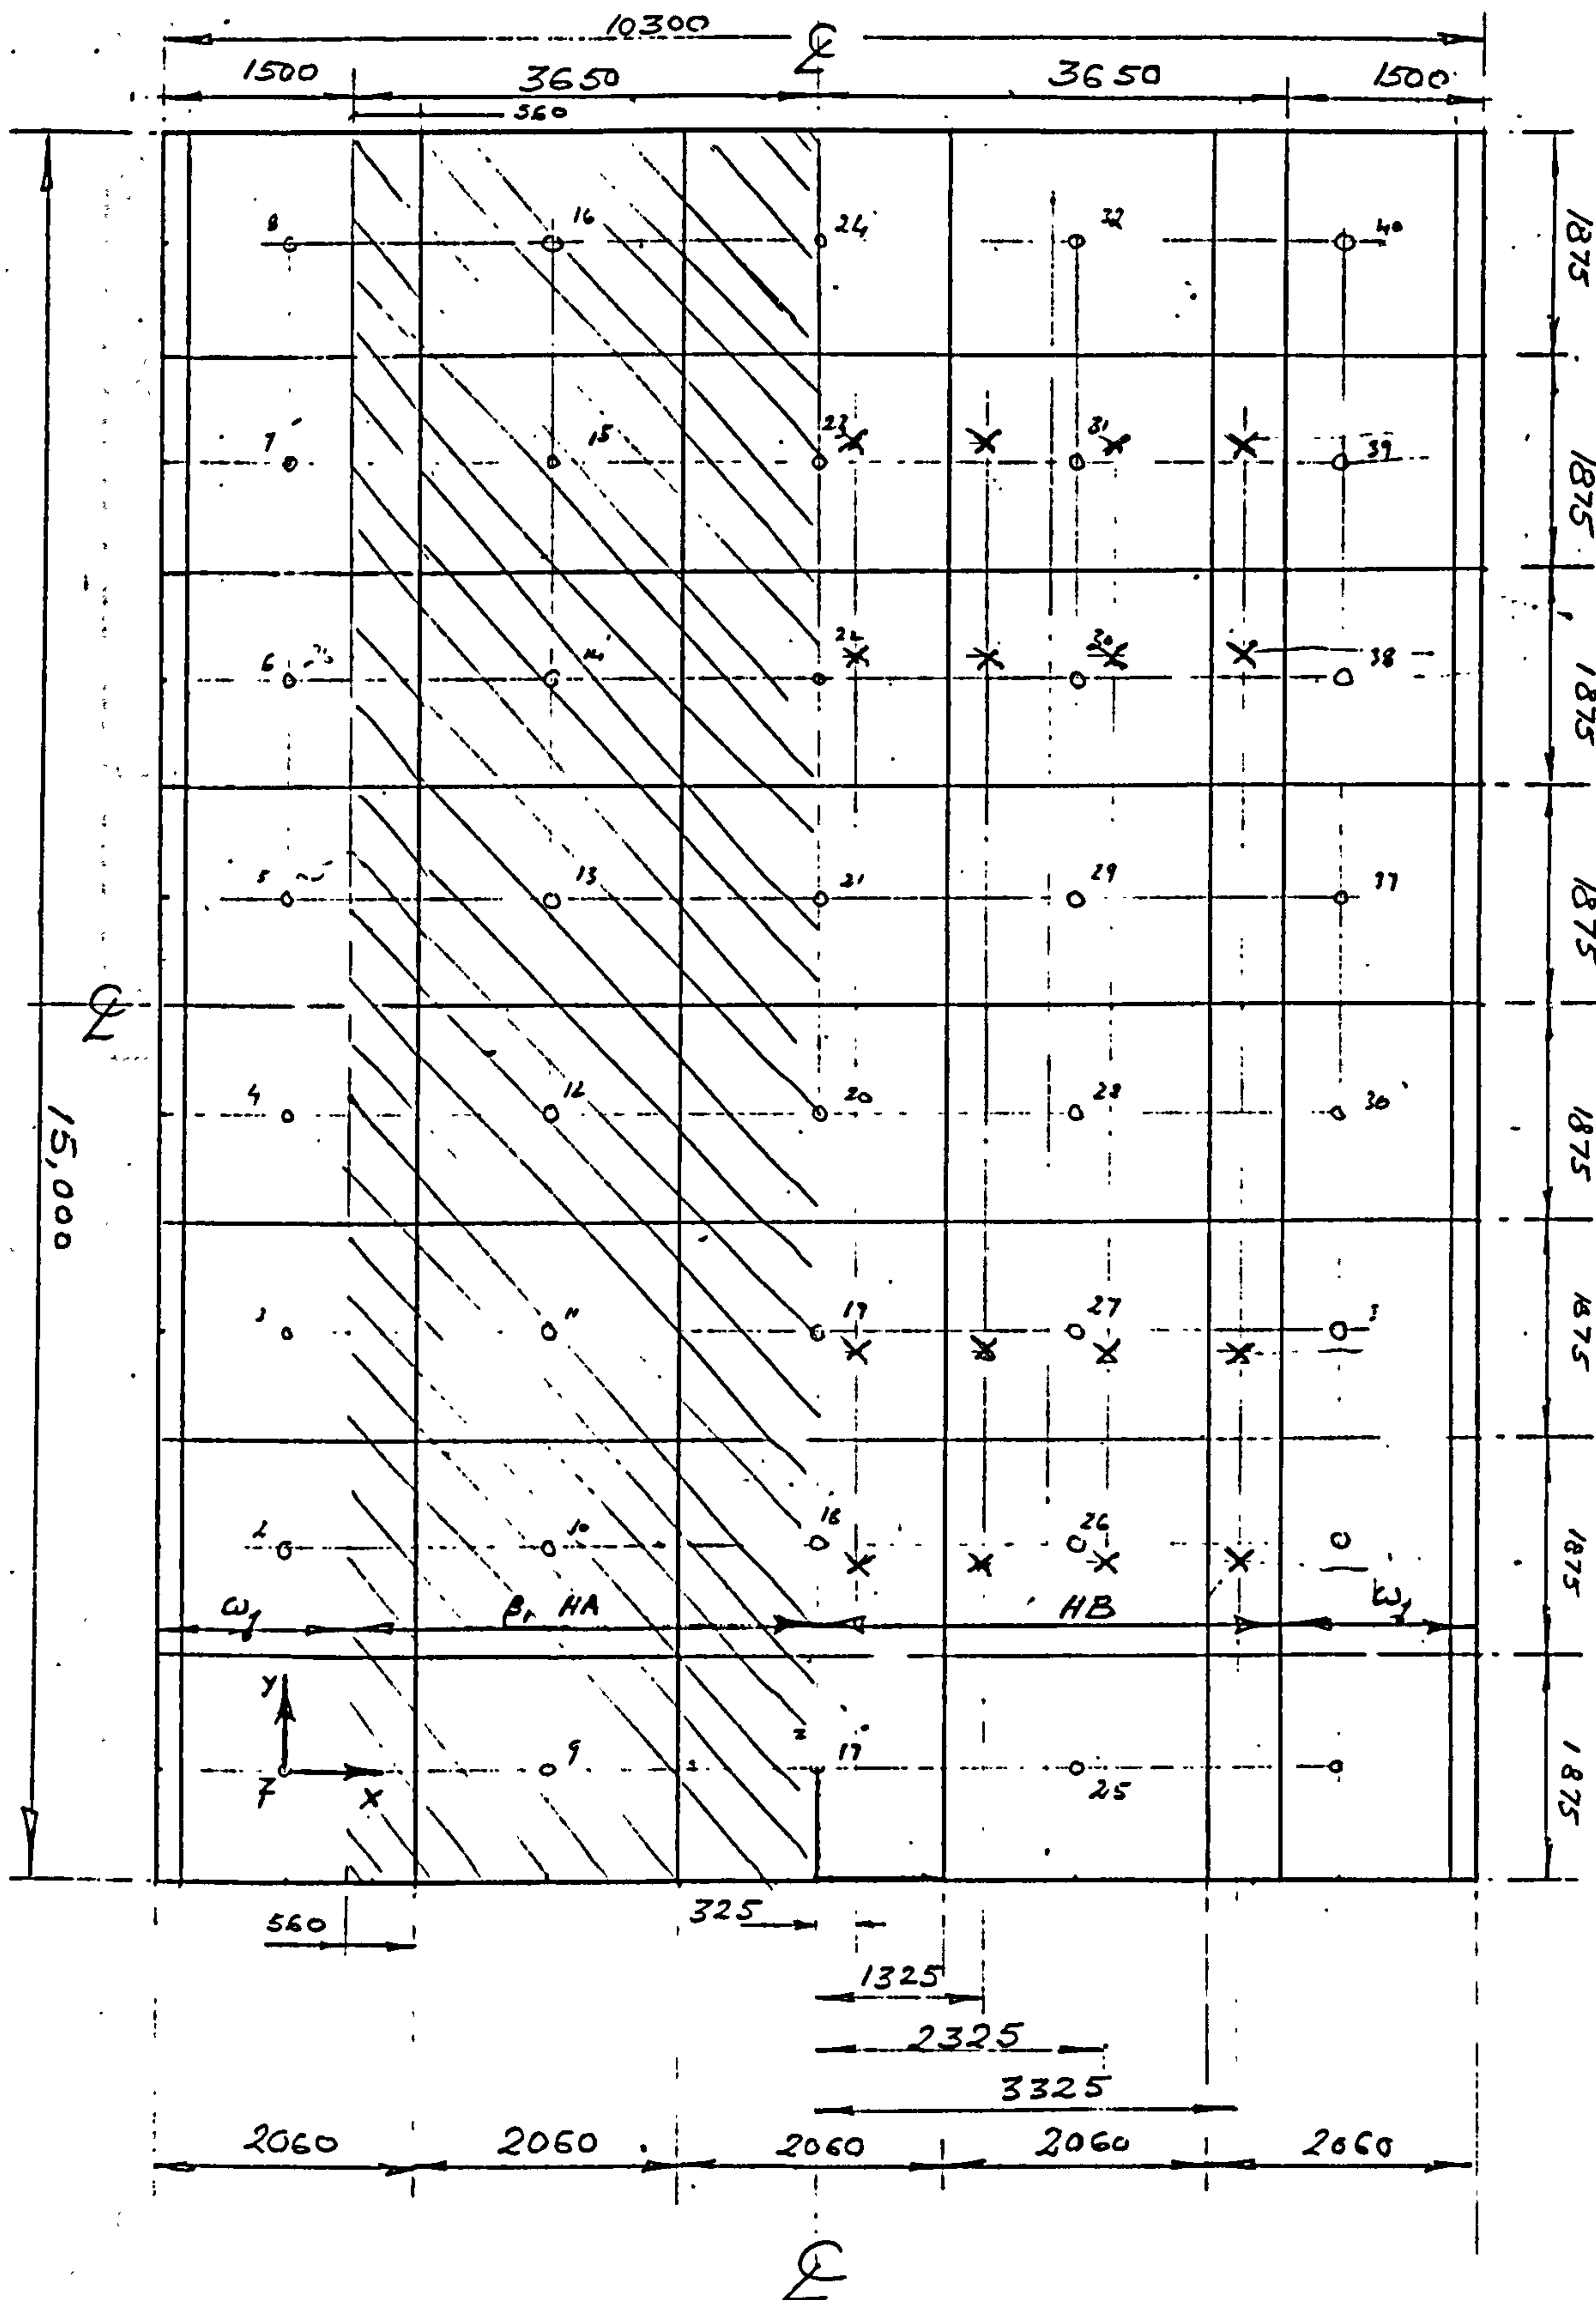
Applying HA and HB on the modelling of the 15m span single carriageway slab bridge.
